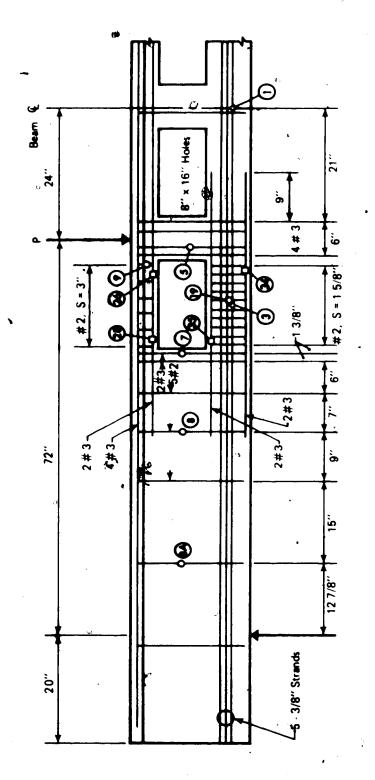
Reinforcement Details and Strain Gage Locations for Beam 24-16-6
